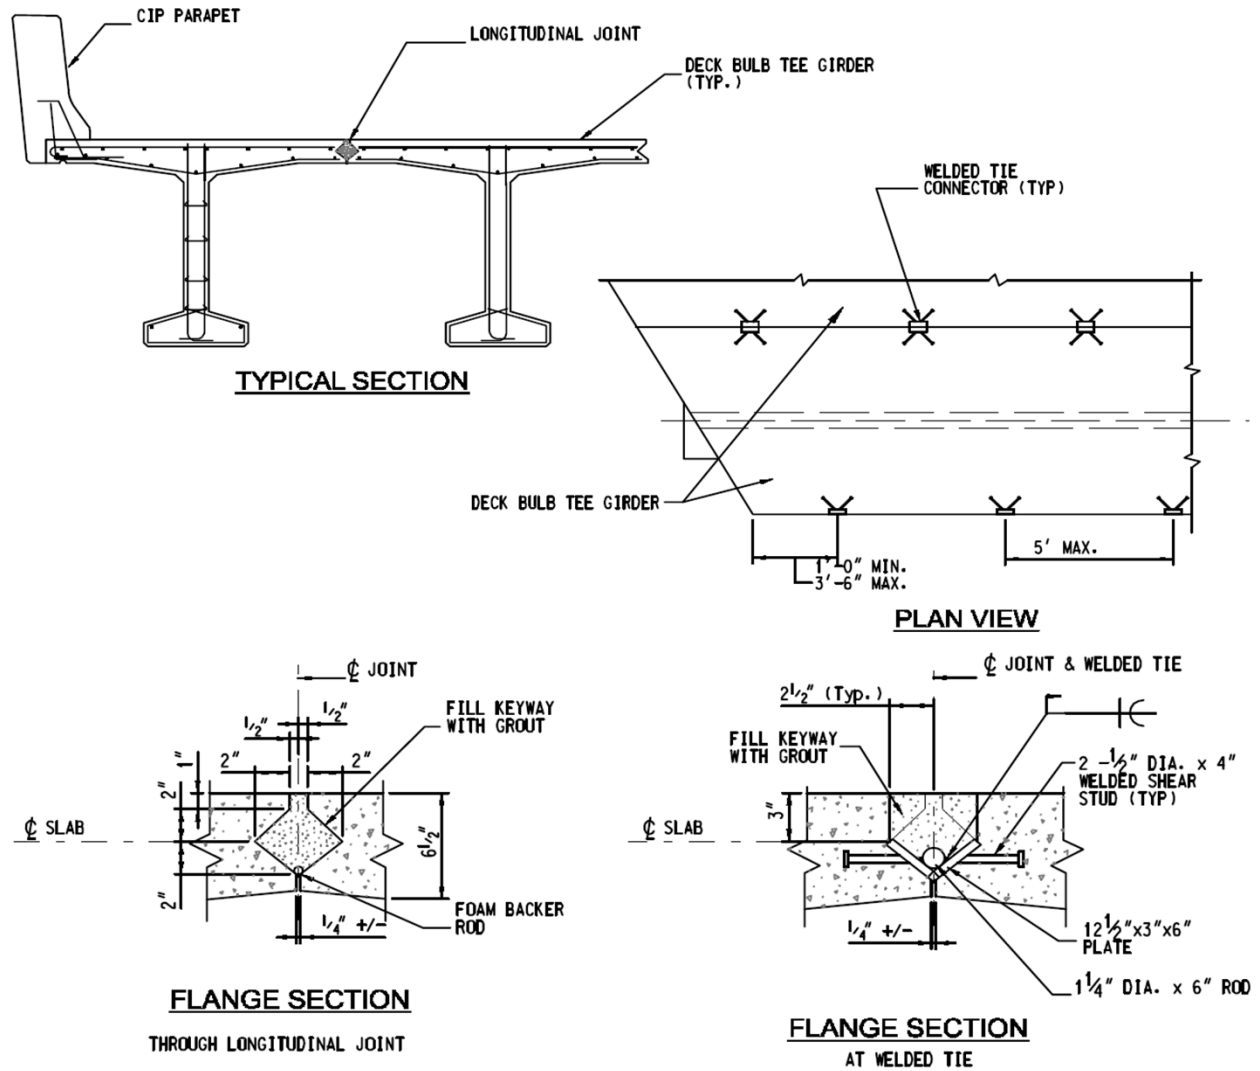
Welded tie connection detail for bulb tee beams used in Washington State, spaced at a maximum of 5 ft.
